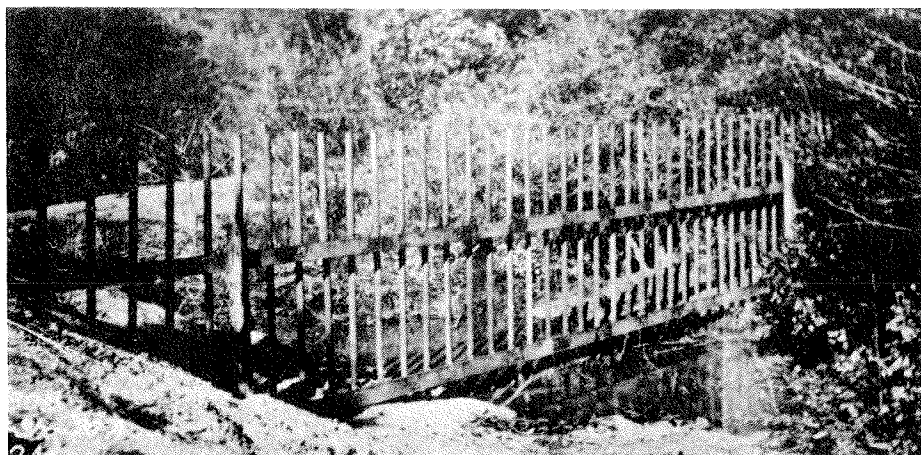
Post and rail debris rack, in place for 35 years, for light to medium floating debris installed 100' upstream of culvert.
